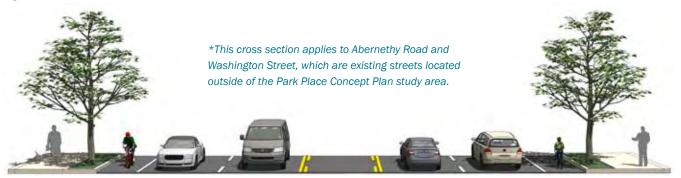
B. Minor Arterial 5-Lane Cross Section\
